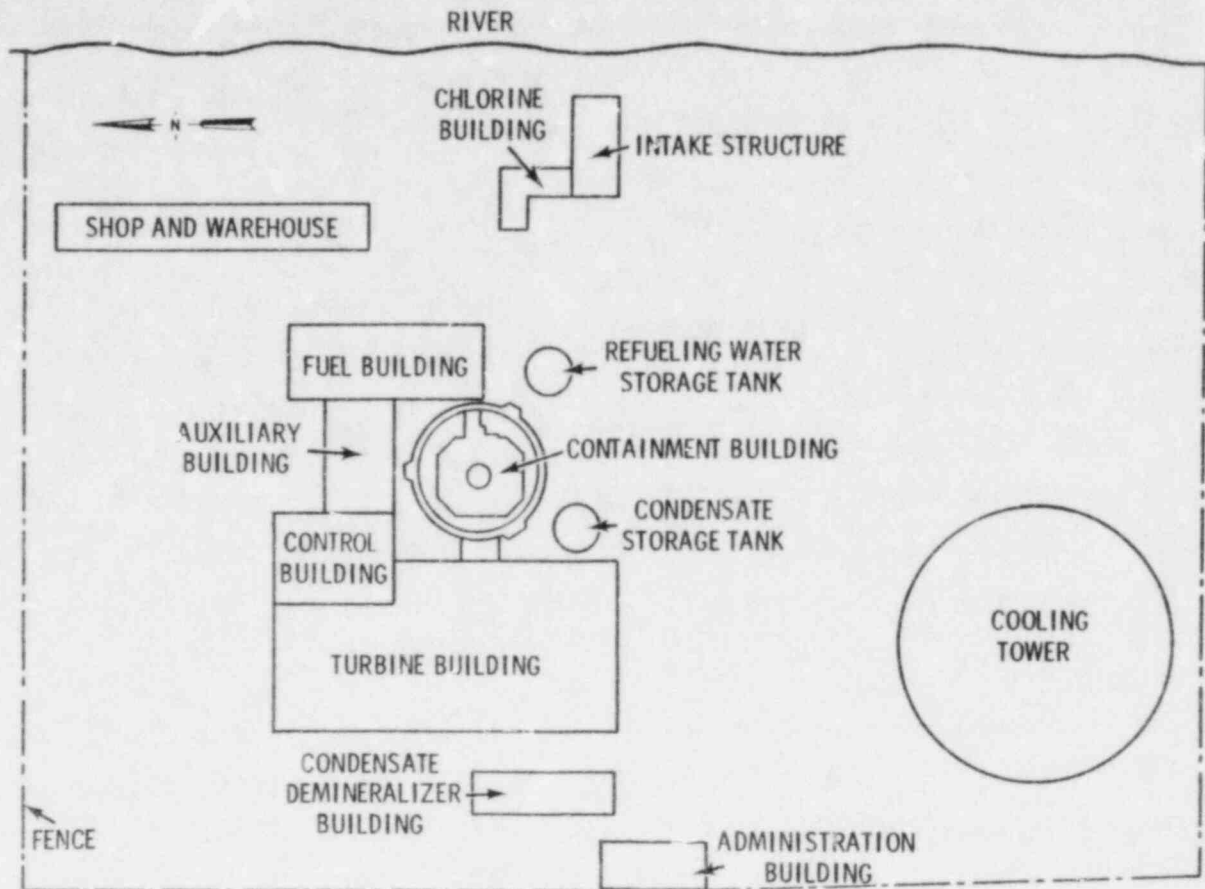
Site Layout of the Reference PWR Power Plant
